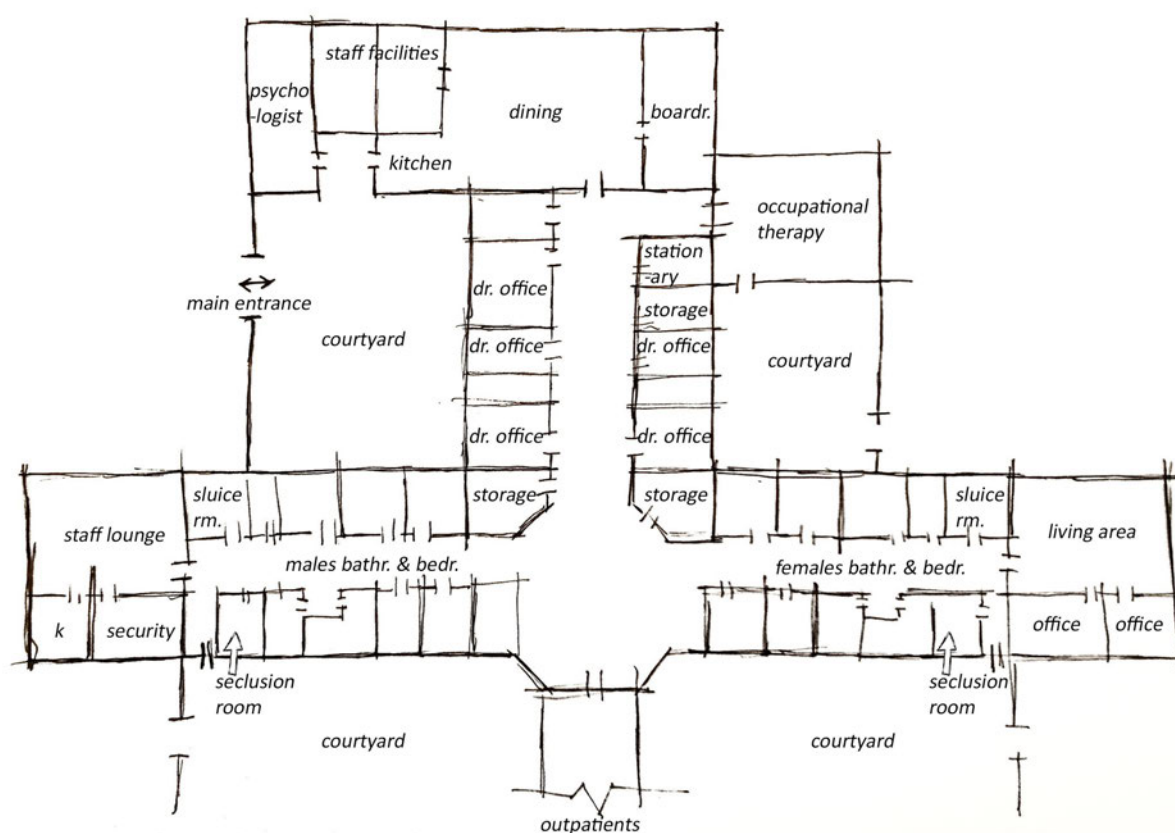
(left) : Quick sketch of the floor plan/ spatial layout of the child and adolescent unit. 2019, By Author.
